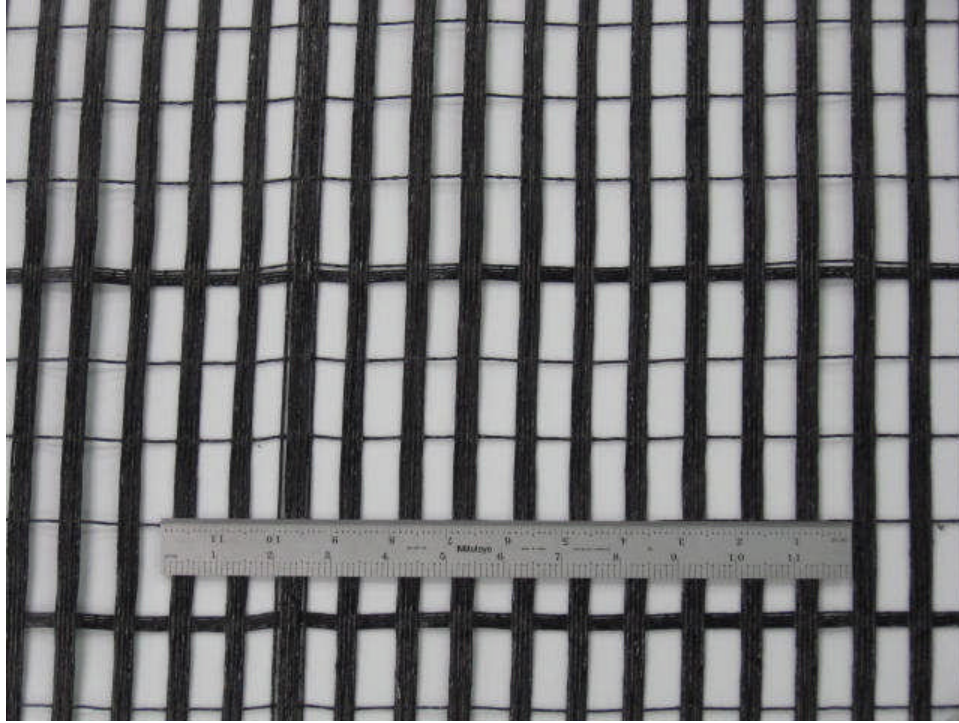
Photo of Miragrid 20XT (machine direction is perpendicular to ruler shown).
